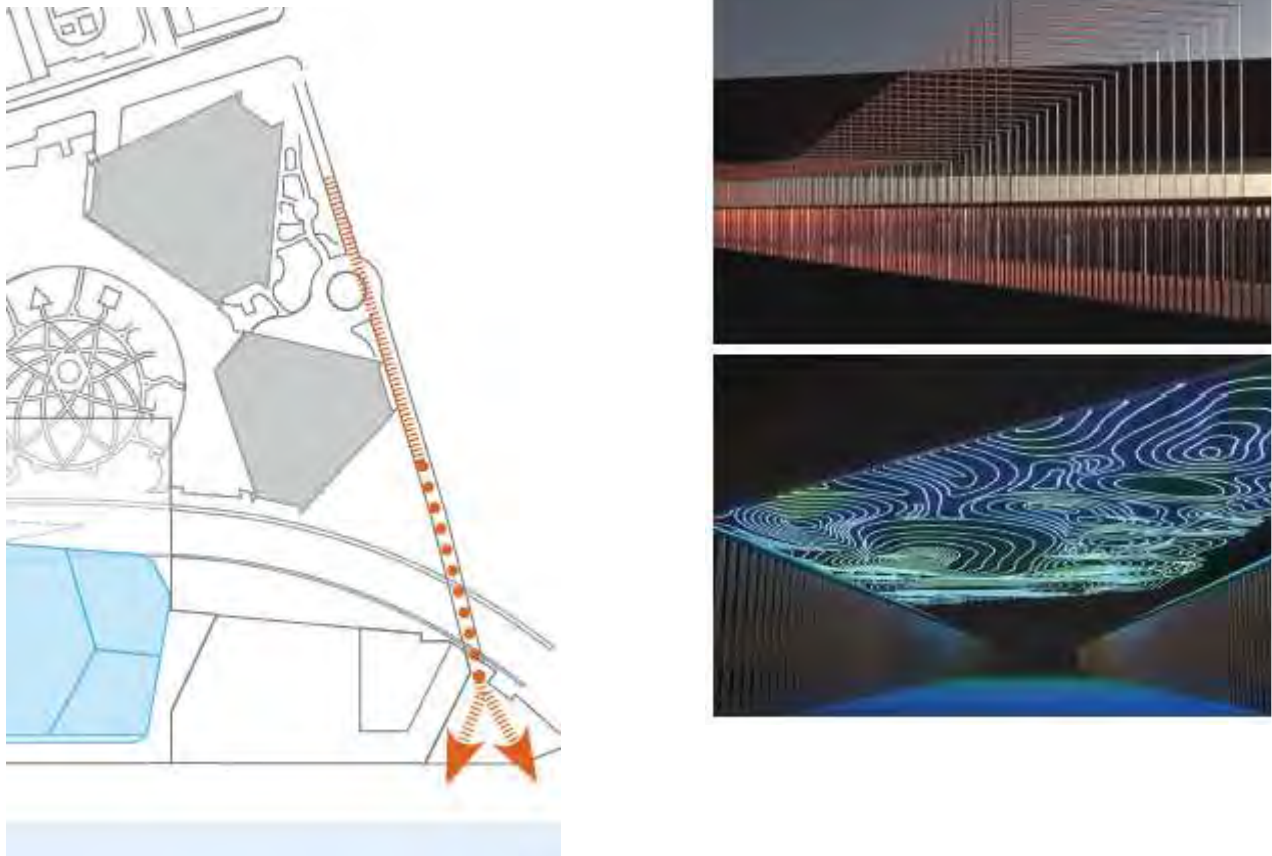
Druitt Street pedestrian link and public art bridge concept
